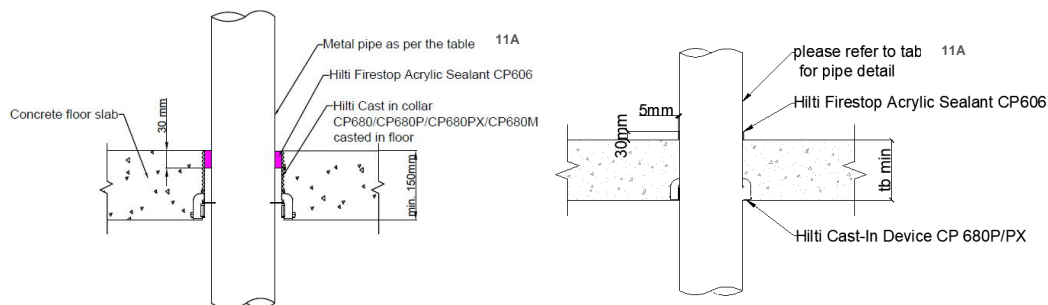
A (Left): Section view – CP 680P/PX cast-in collar in 150 mm concrete slab detail
